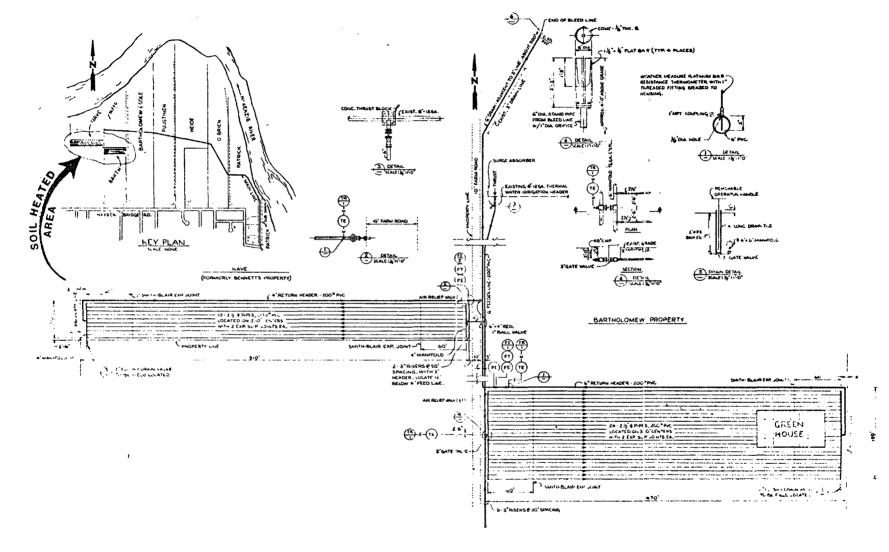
Undersoil heating with greenhouse location -- plot plan and details
